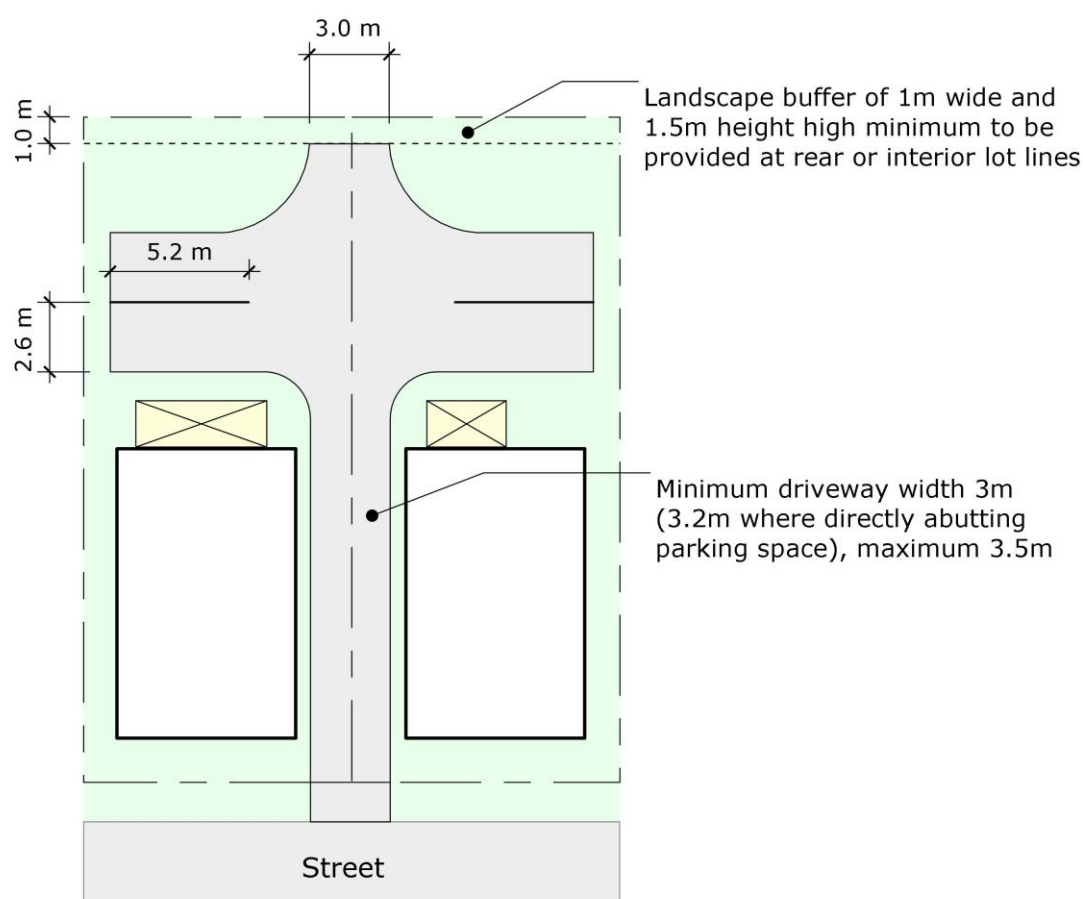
illustrates the minimum and maximum driveway width, the hammerhead turnaround requirement, and the landscape buffer location and size for a shared driveway leading to parking spaces across multiple rear yards.
